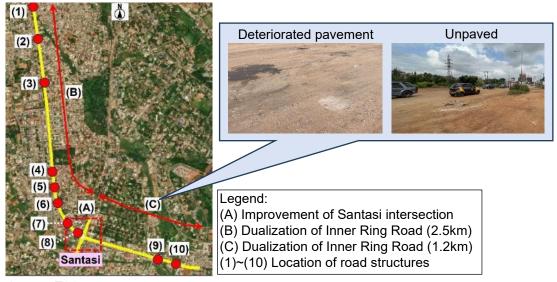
Locations of Road Structures in Combination Scheme-2
